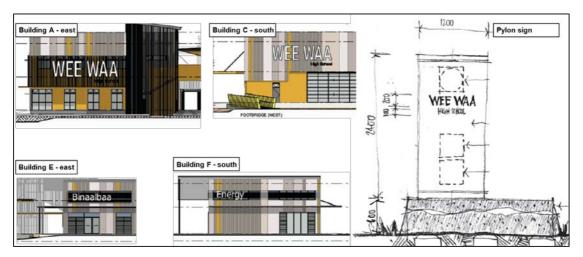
| Building mounted signs (left) and pylon sign (right) (Base source: Applicant's SRtS)
